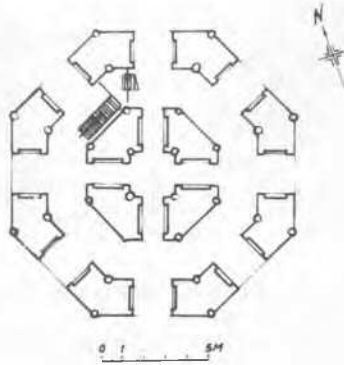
Cross Section through the Base Story, as well as the Foundation Plane of the Pagoda.
